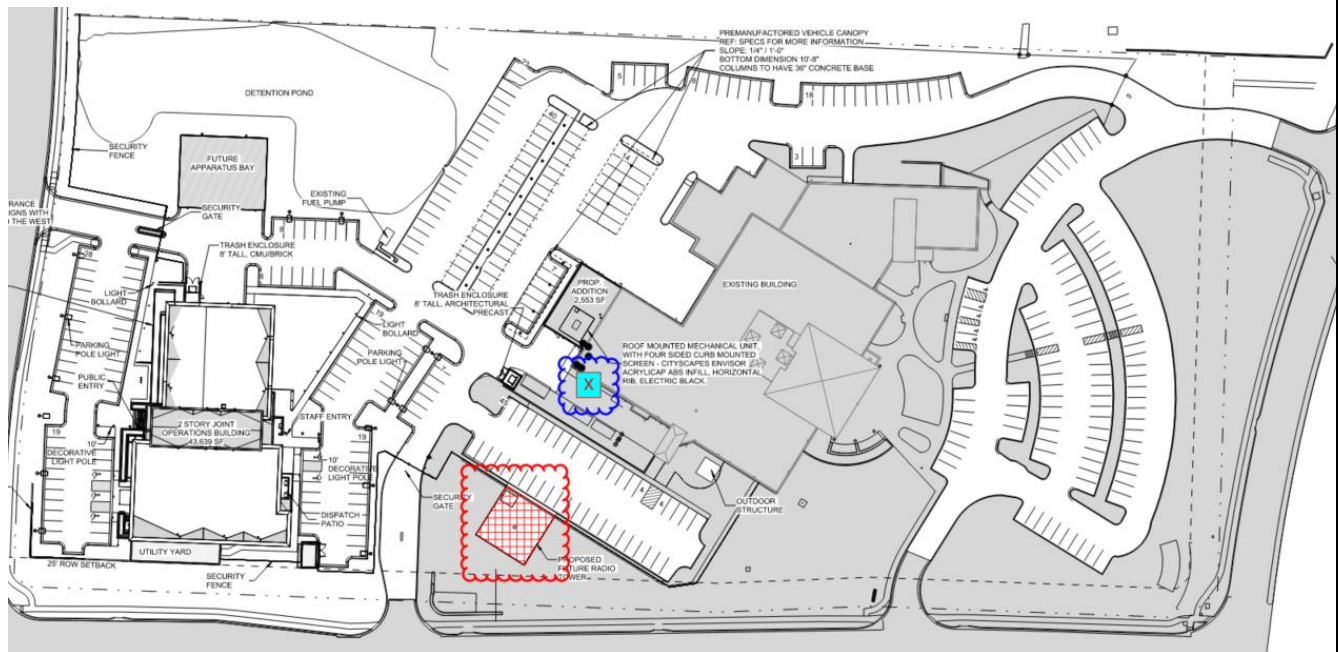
Site Plan (proposed tower location clouded in red; existing tower location clouded in blue)
